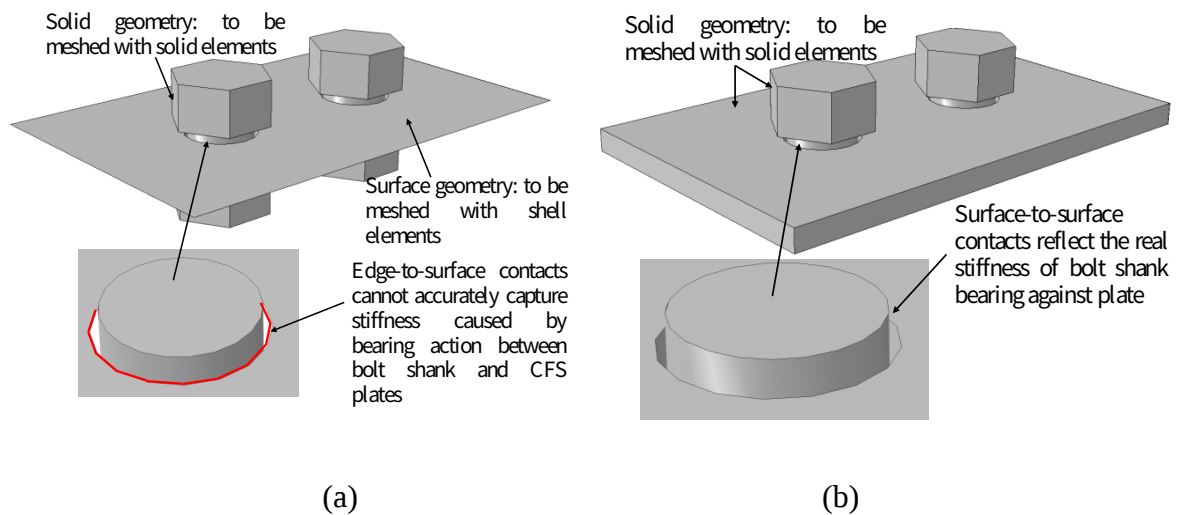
Traditional FE modelling techniques for considering bearing action between bolt shank and CFS plate (a) edge-to-surface contact and (b) surface-to-surface contact.
